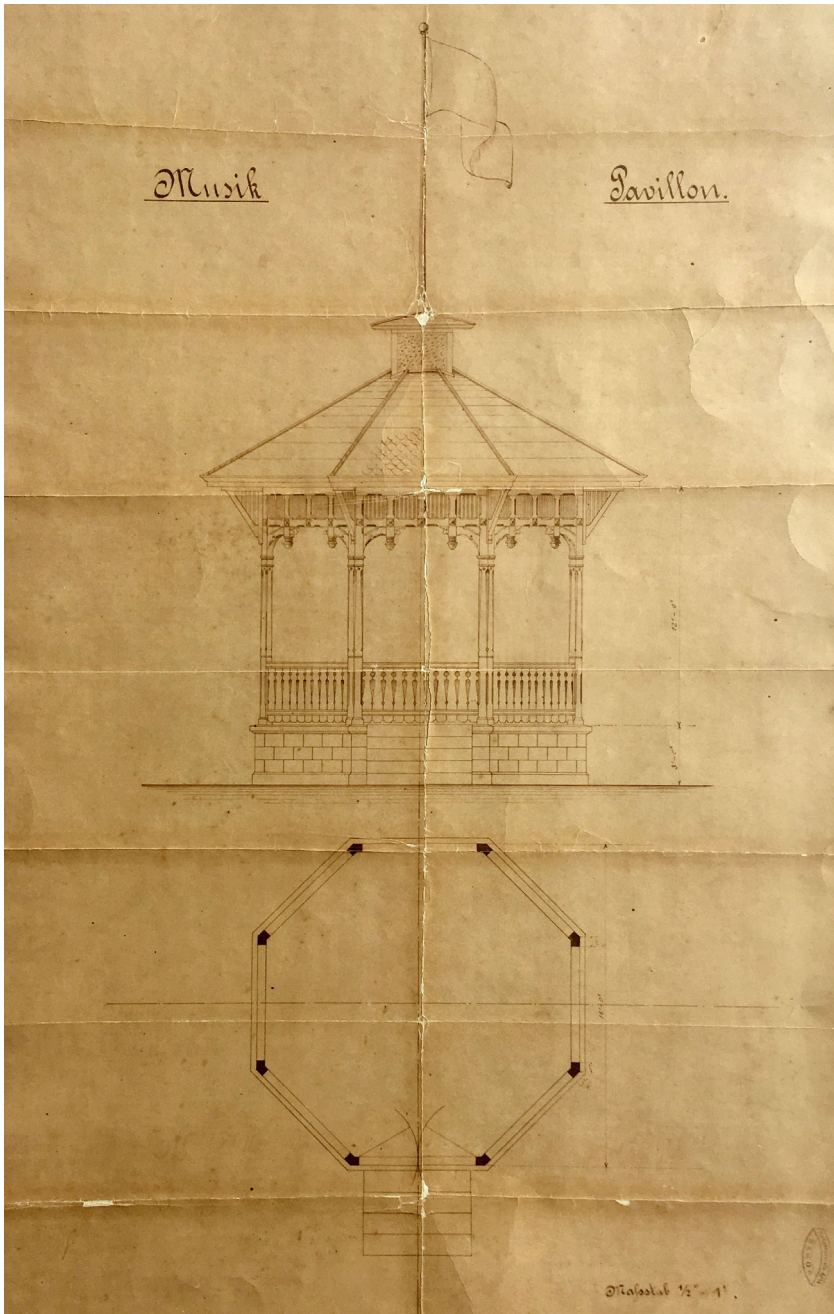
Albert Schaaffhausen, 'Musik Pavillon', 1909 (Archives New Zealand)
